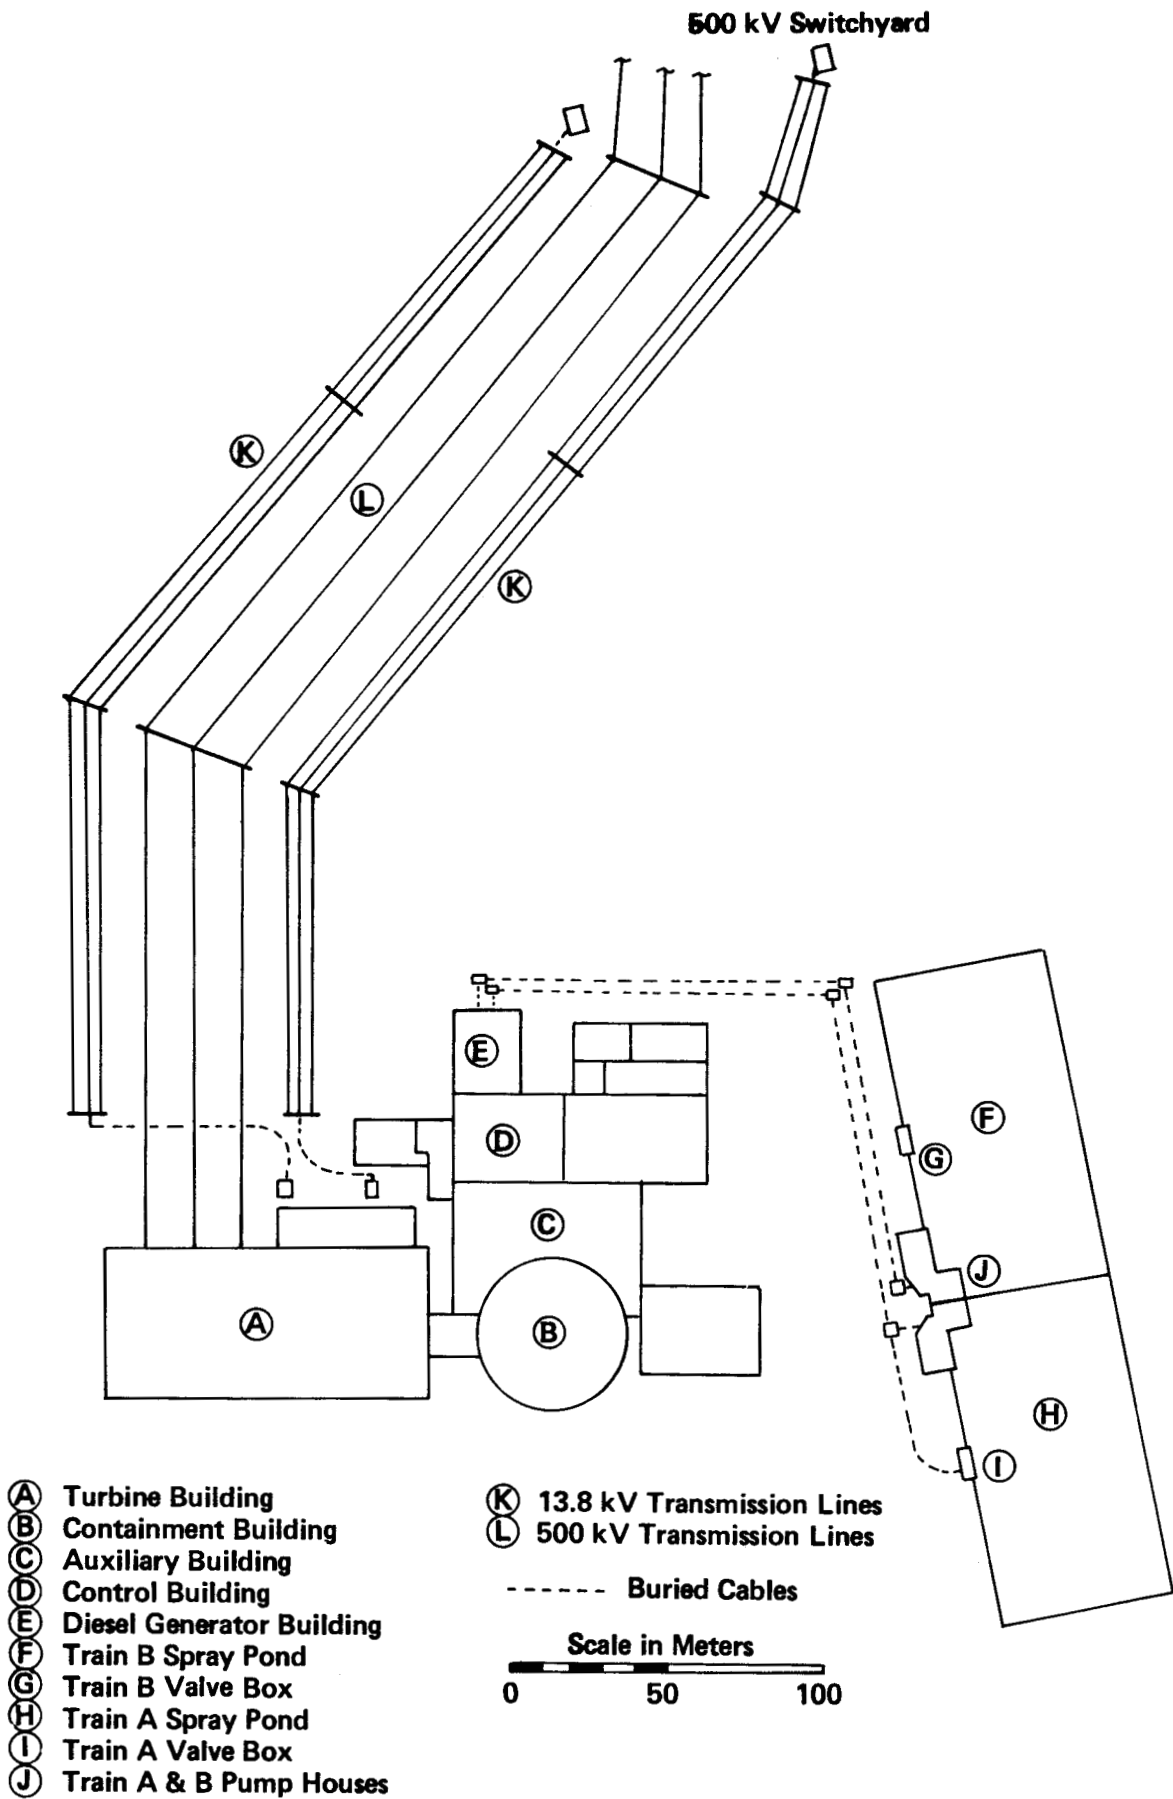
Plot Plan of Palo Verde Nuclear Generating Station
